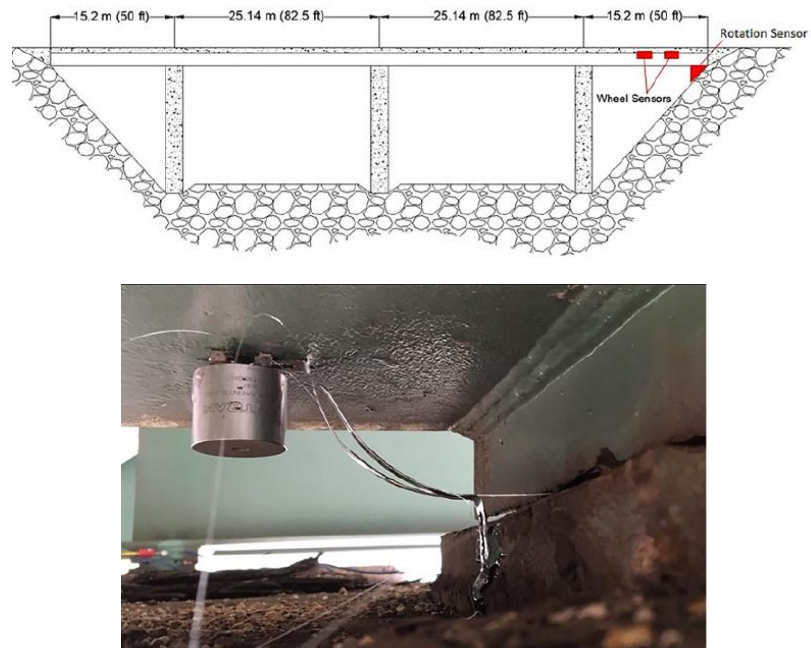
Installation Plan and Rotation Sensor Installed under the Girder (reprinted from Oskoui et al. 2019).
